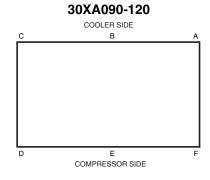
A — Unit Mounting Weights (Units with MCHX Condenser Coils) (cont)
